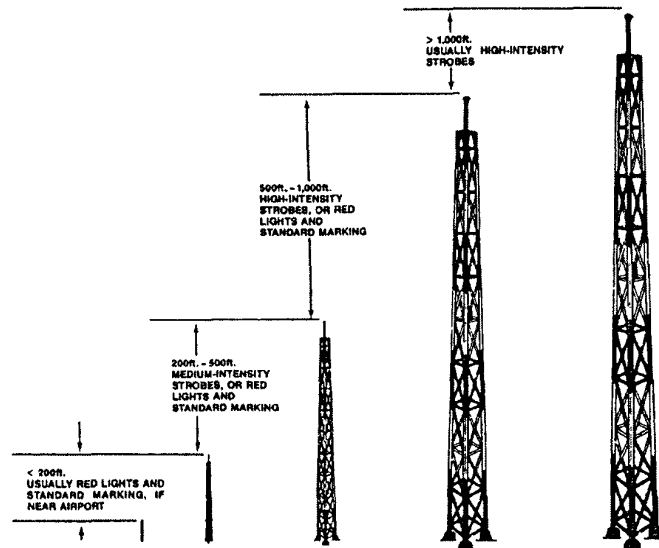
Common approaches to tower obstruction marking and lighting. (After [1].)
